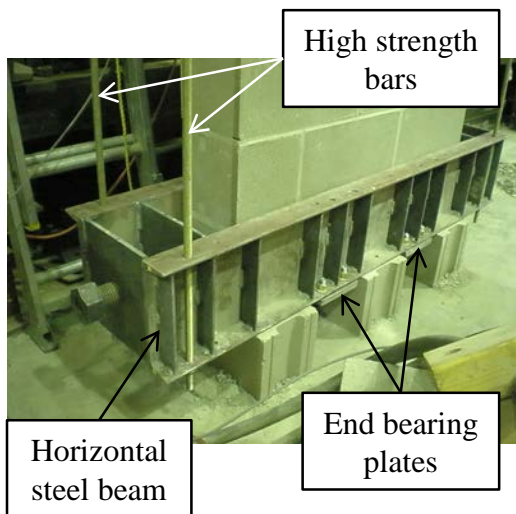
Details of the horizontal steel beam of the frame and end bearing plate used to rotate and translate the wall splice specimens – Modified from Ahmed (2011).
